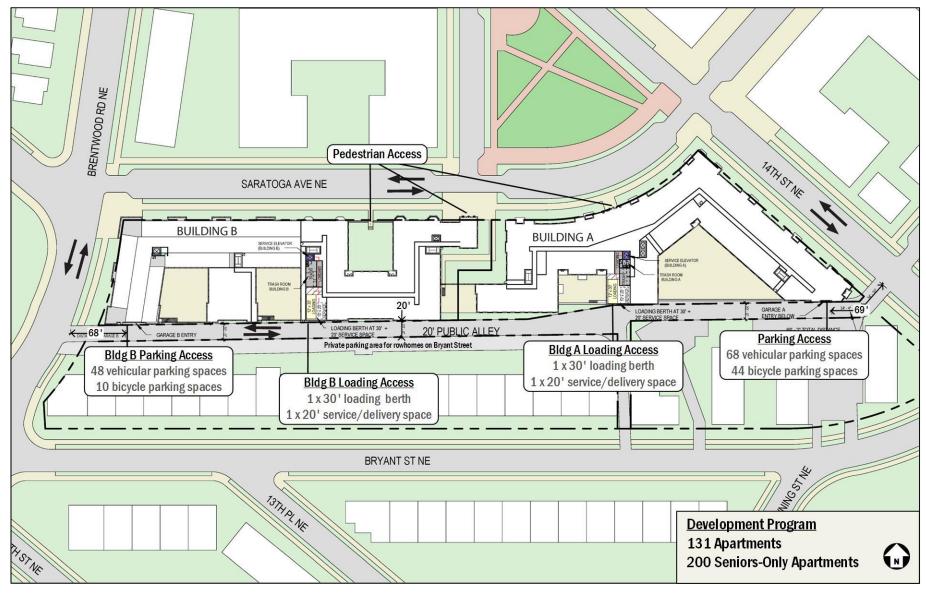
Block 7 Stage 2 Site Plan (per ZC Case 14-18A)
